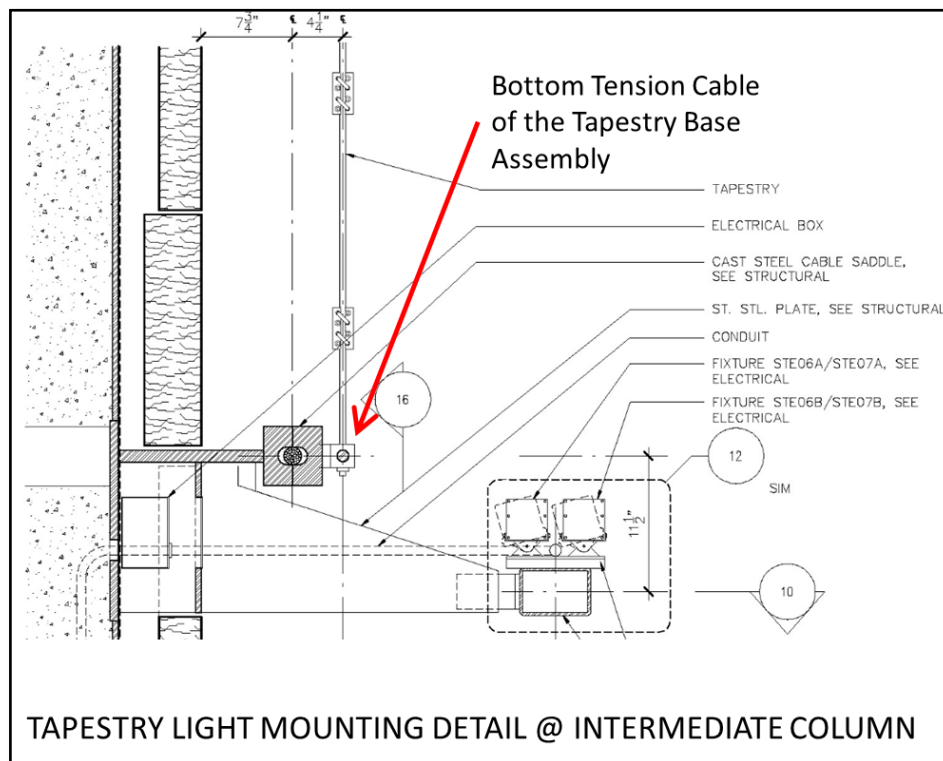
Bottom Tension Cable of the Tapestry Base Assembly
